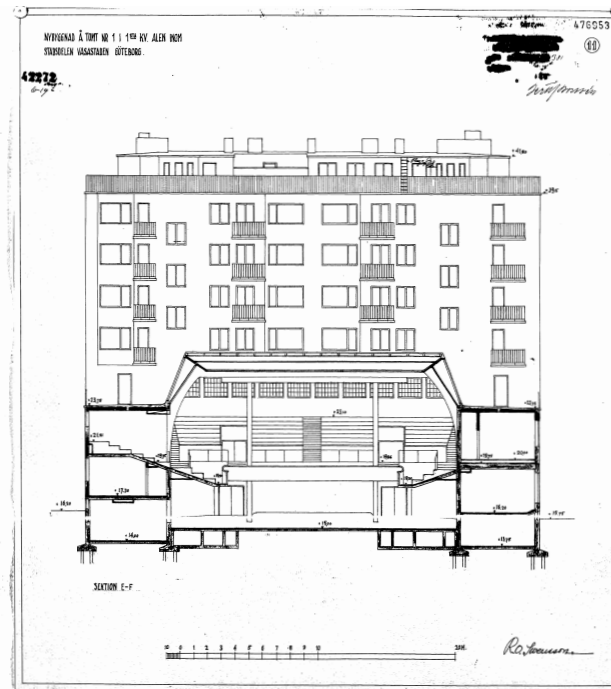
East elevation/section. Original drawing (1940) (Göteborgs Stad., n.d.)
